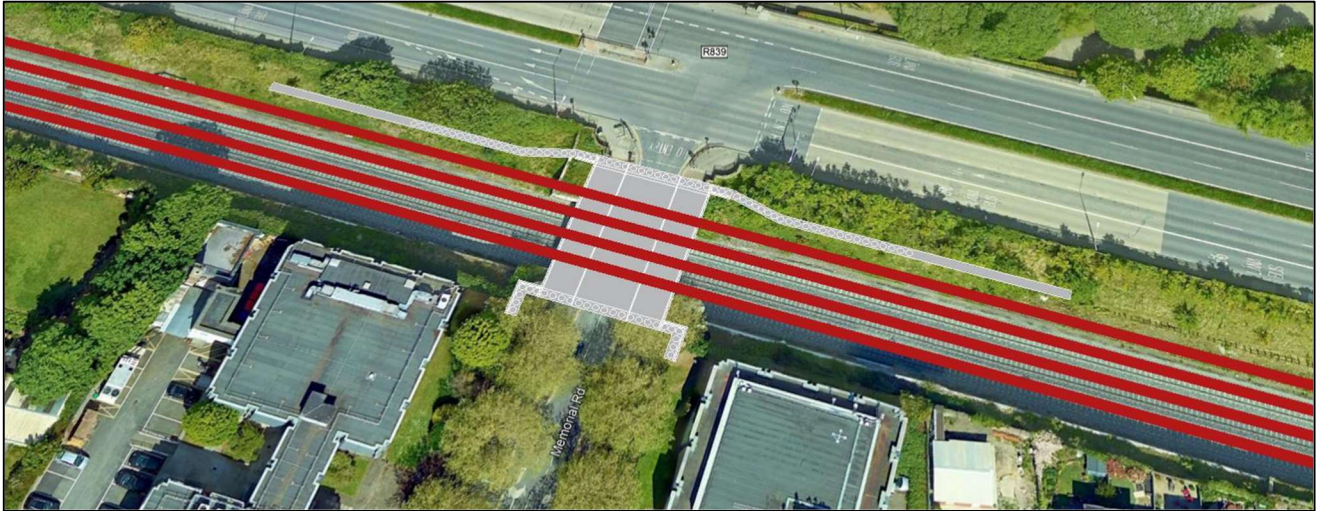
Memorial Road Bridge (OBC3) - Bridge Option 3
